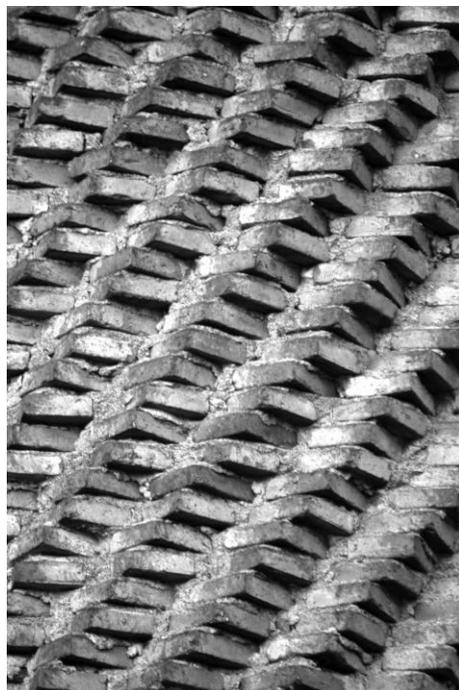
Detail of brickwork in Pelegrin Pipas chimney, Mora (Toledo) (Photo: author)
